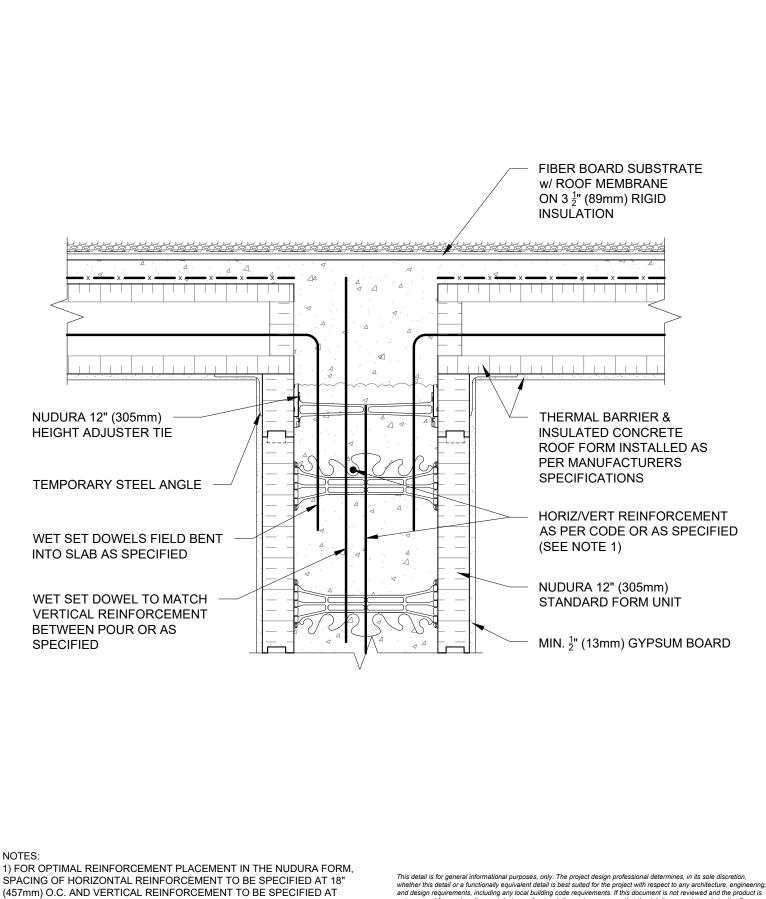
" (305mm) Form Unit, Steel Joist Roof, Non-Bearing Demising Wall			File Name:
